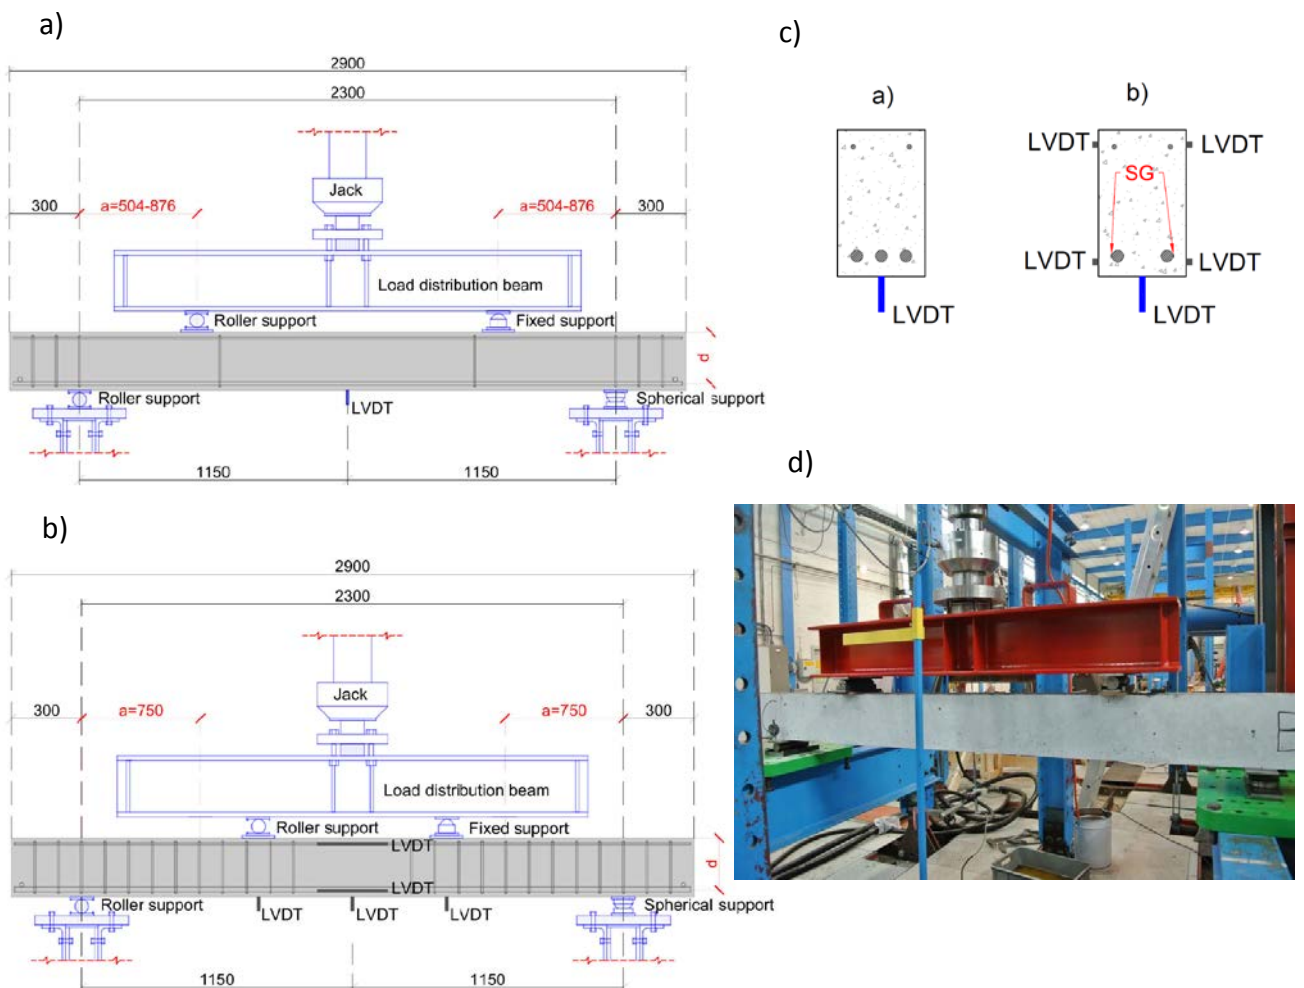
Test set-up of beams a) without shear reinforcement; b) with shear reinforcement; c) detail middle cross section for beam without and with shear reinforcement; d) view from the laboratory.
